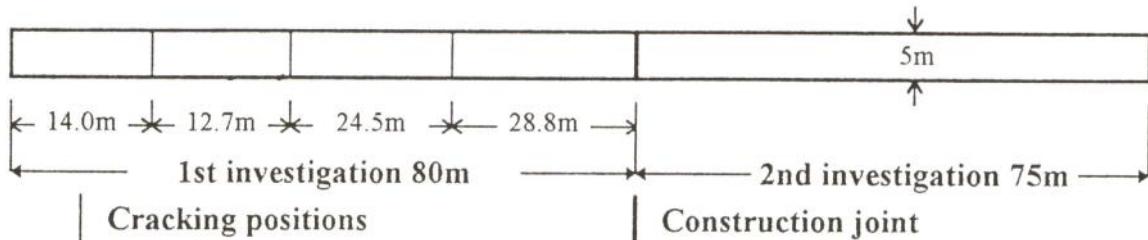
Tested RCCP section showing construction joint and cracking positions
